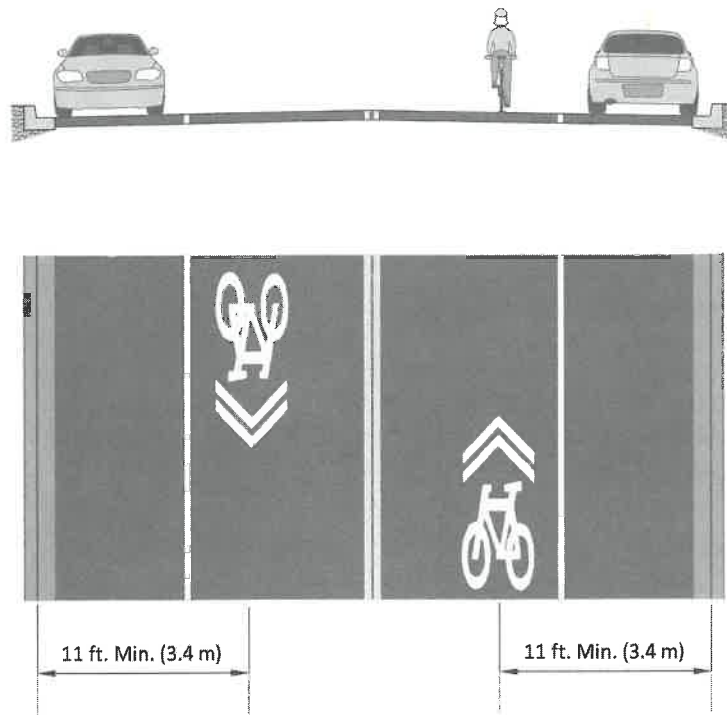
Typical Shared-Lane Marking Cross Section on Street with Parking
